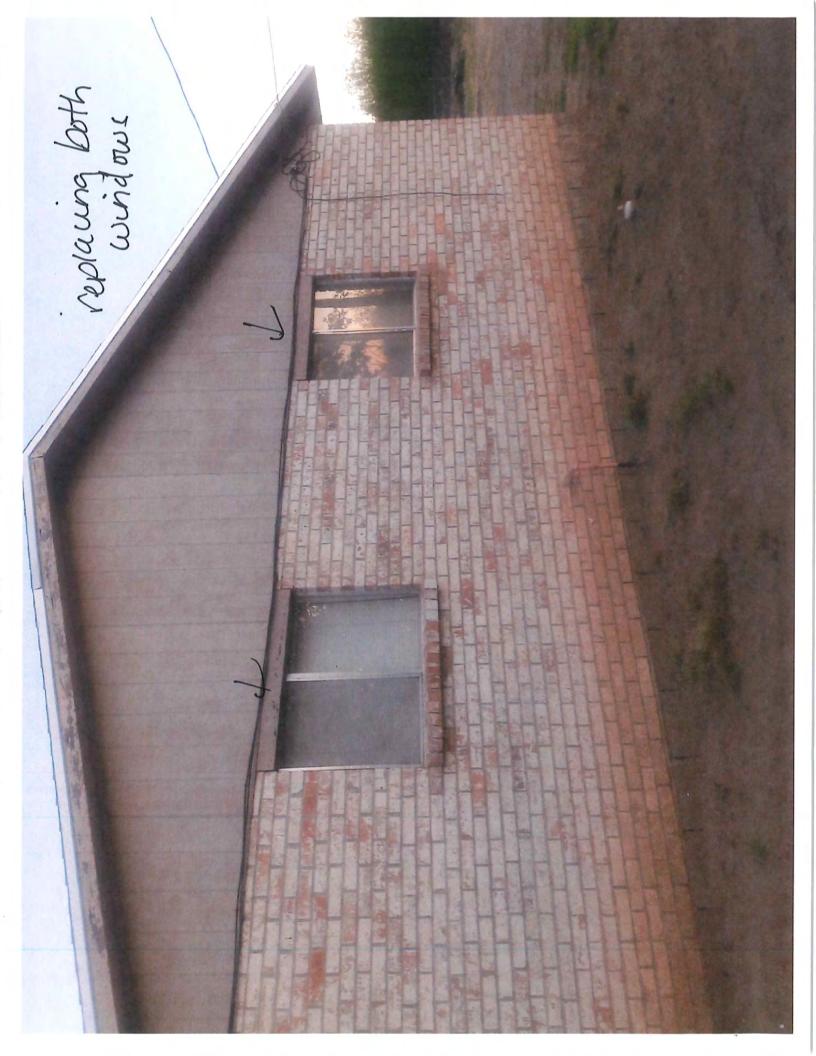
PHOTOS OF DWELLING FROM ESTRADA ROAD SHOWING WINDOWS TO BE REPLACED
